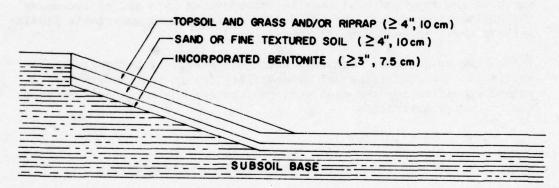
Cross-section of pond sealed with bentonite (Section 94.222)
